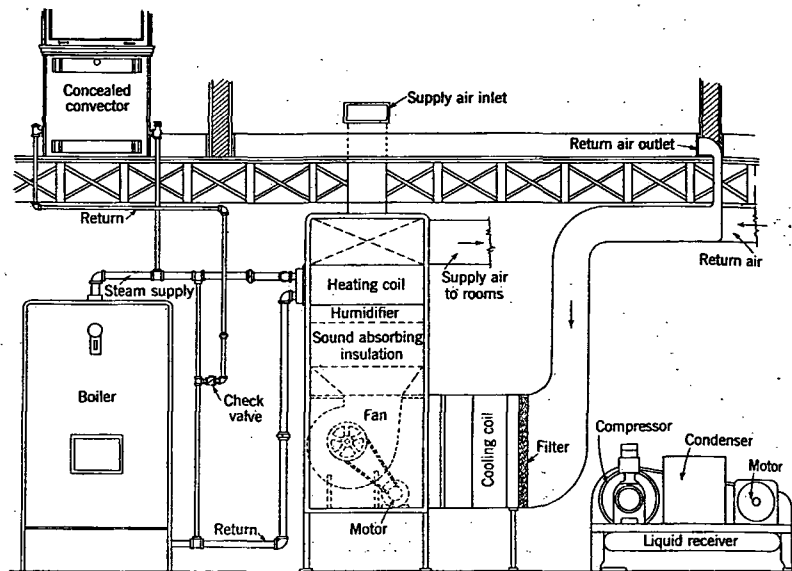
RESIDENTIAL CONDITIONING UNIT WITH STEAM BOILER
